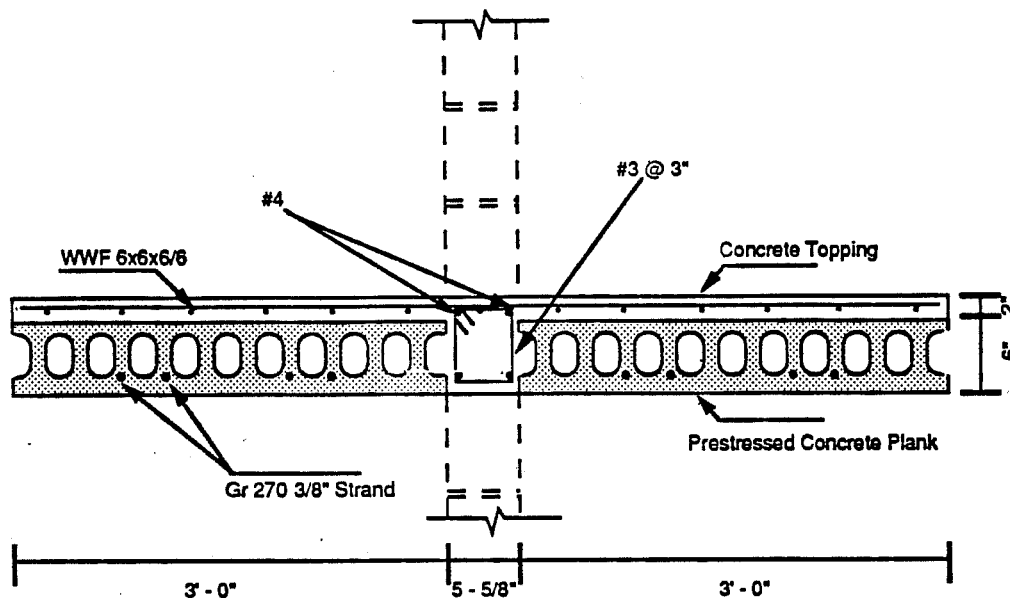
Specimen 2b Slab Reinforcement Detail
